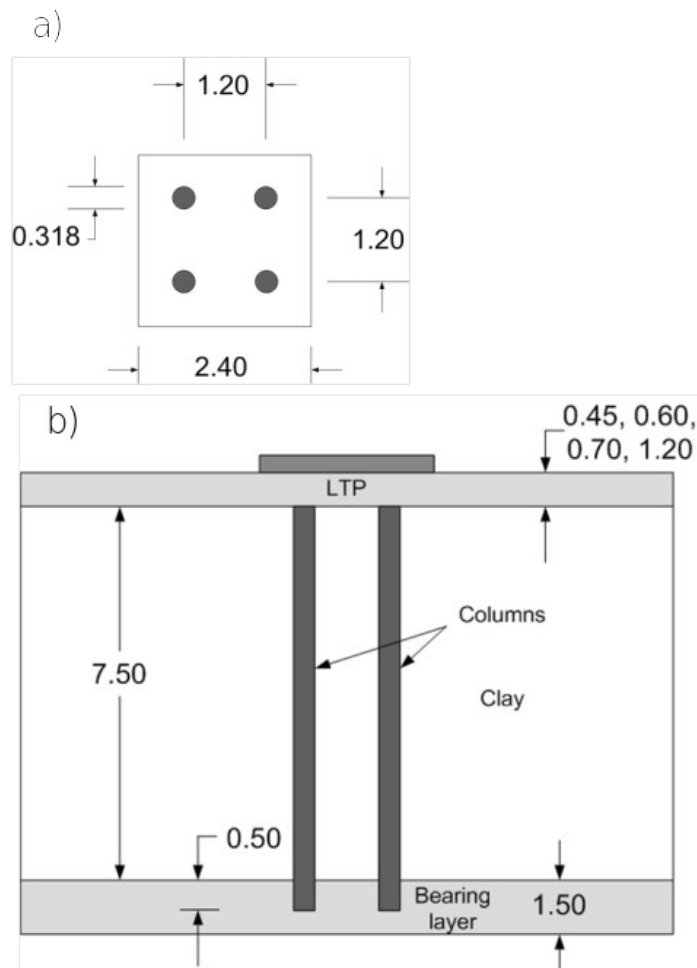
Layouts tested in centrifuge testing program, a) plan view above footing and b) cross section – All dimensions in meters – not to scale.
